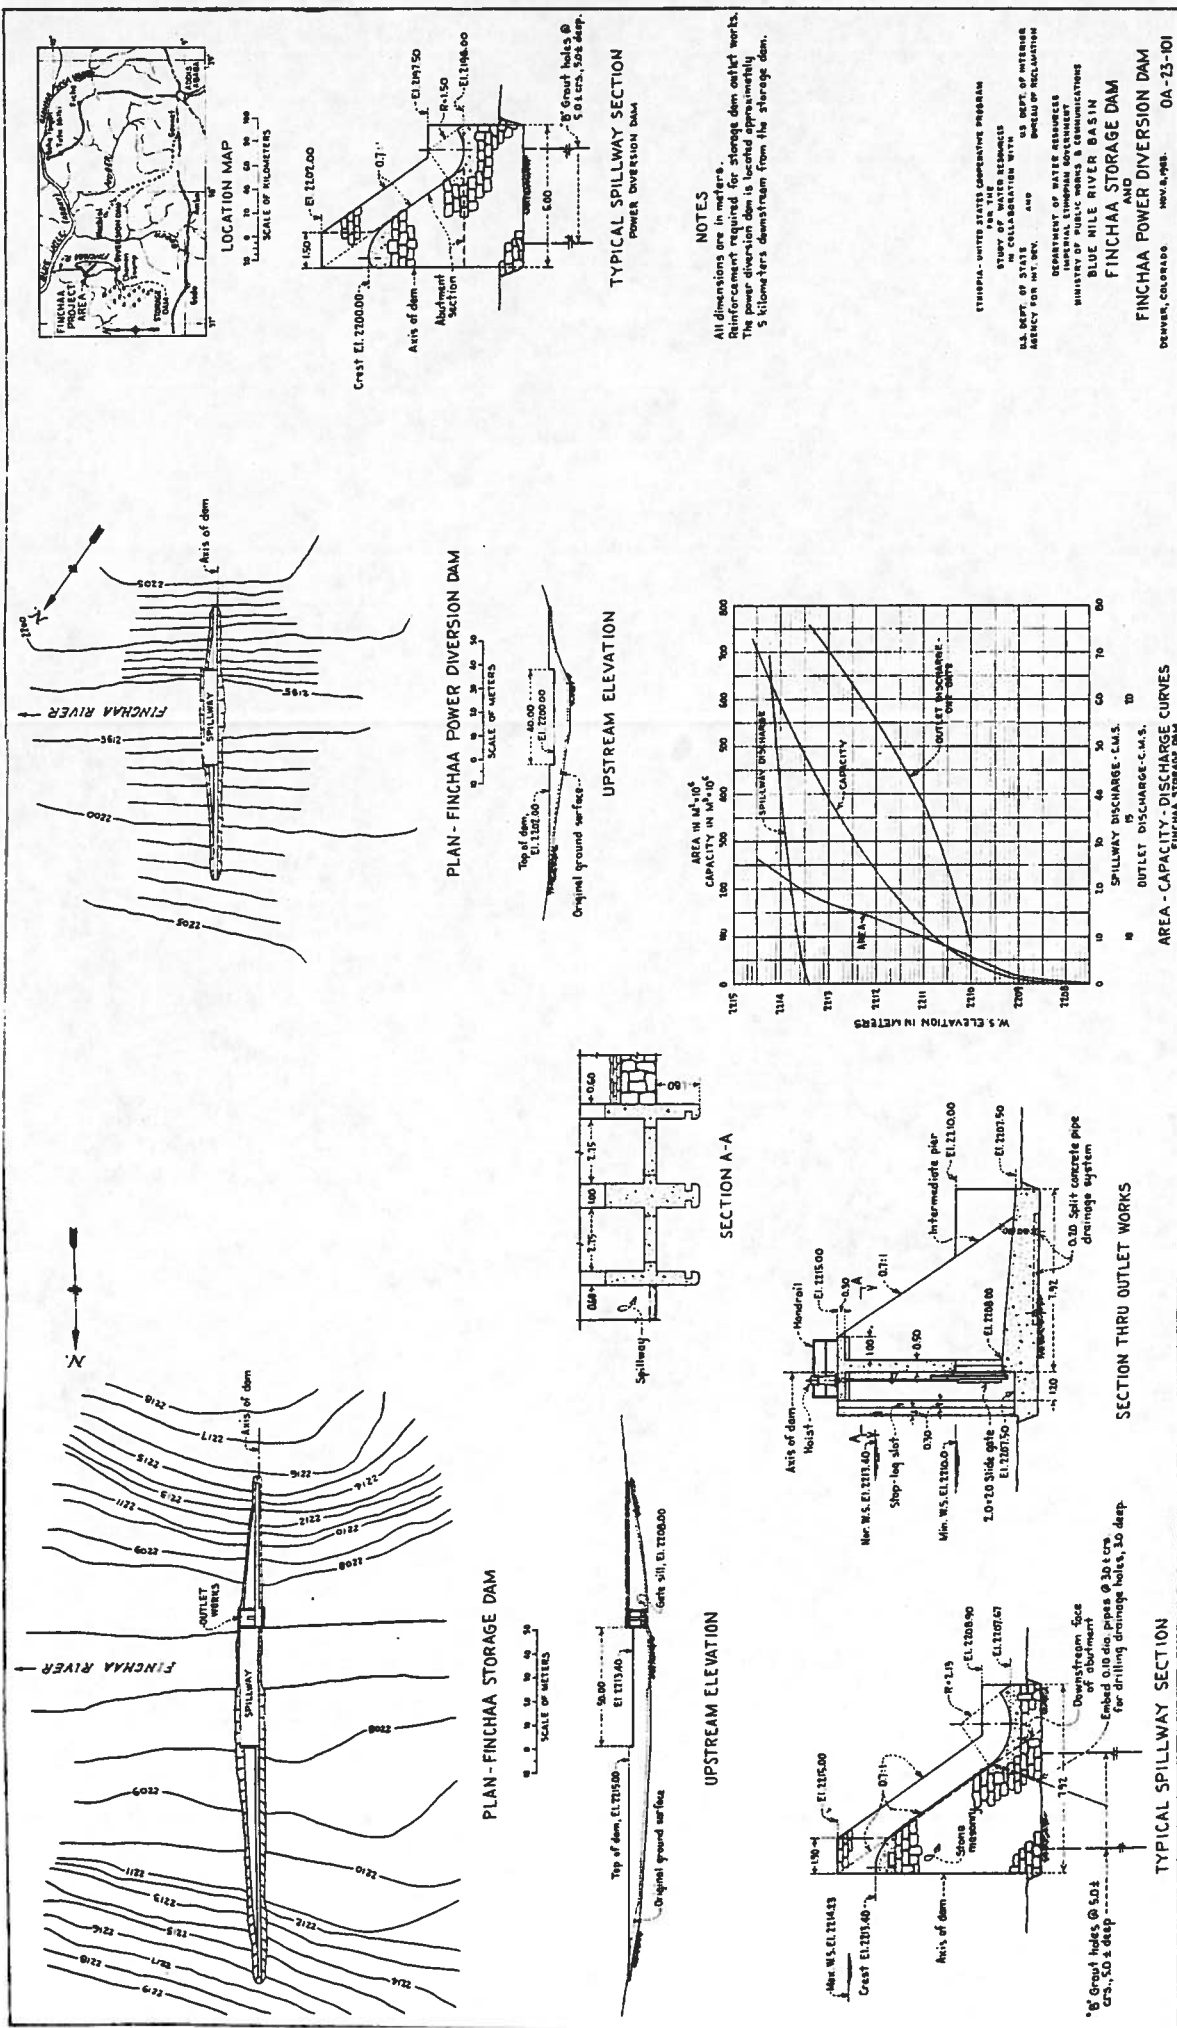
Finchaa Storage Dam and Finchaa Power Diversion Dam--Plans and Sections
